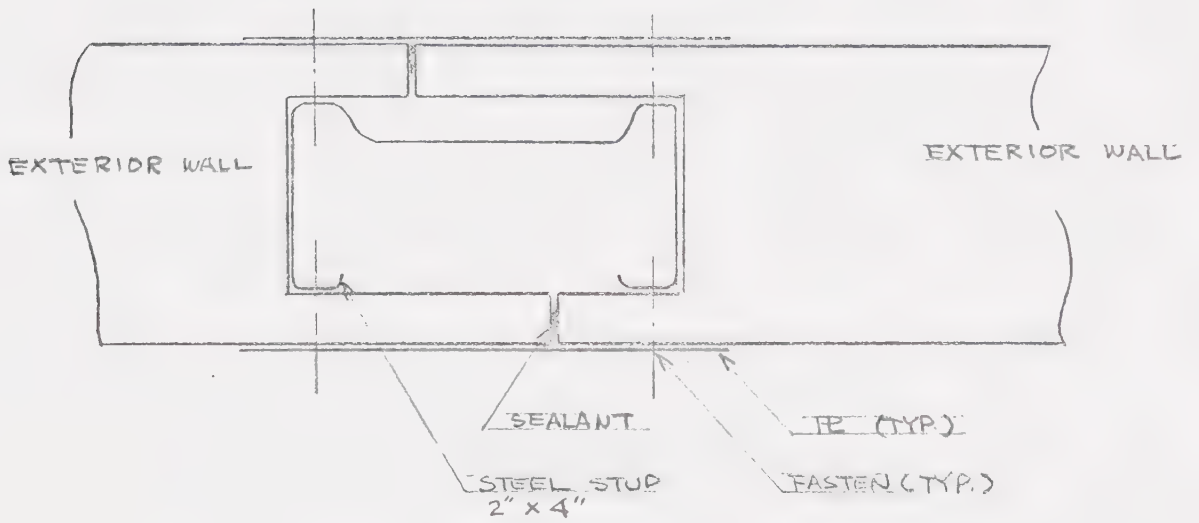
THE STRAIGHT CONNECTION FOR EXTERIOR WALL PANELS
